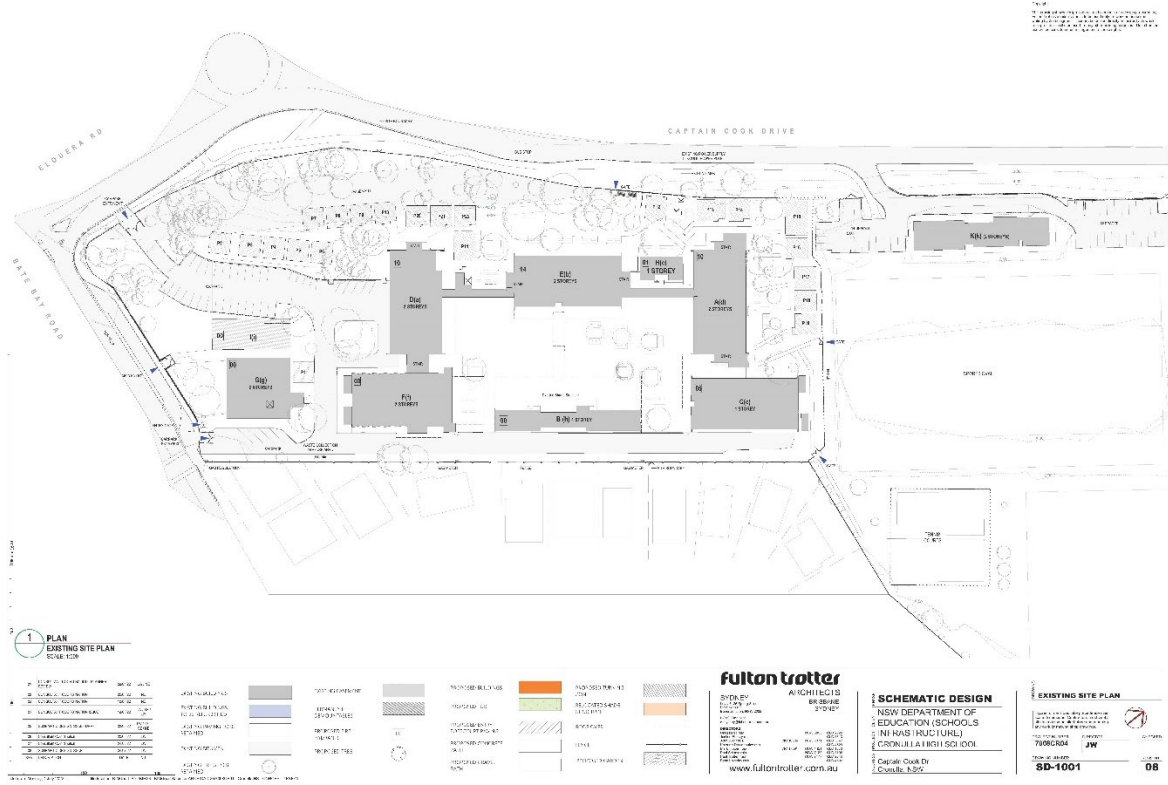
Existing layout plan of Cronulla High School. (Source: MBB Group 2022)
